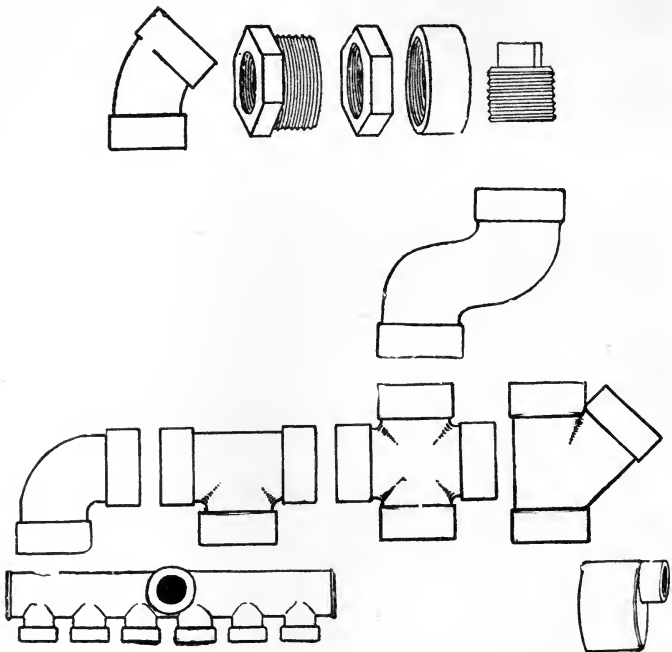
Soft cast-iron fittings for wrought pipe.
